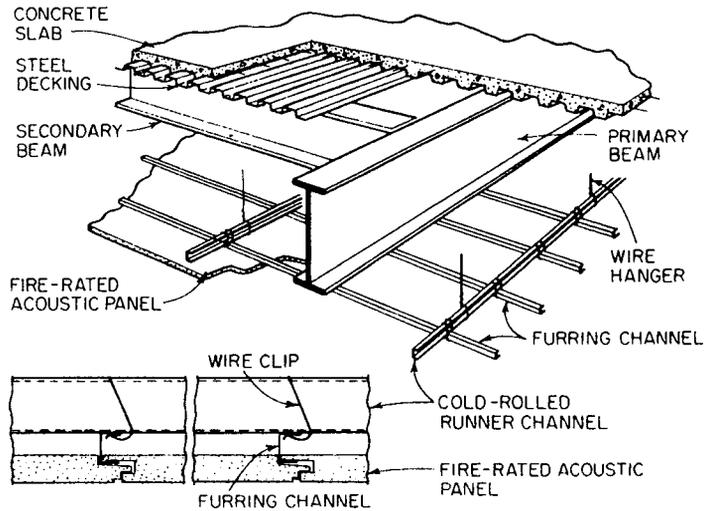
Steel floor system fire protected on the underside by a suspended ceiling.
